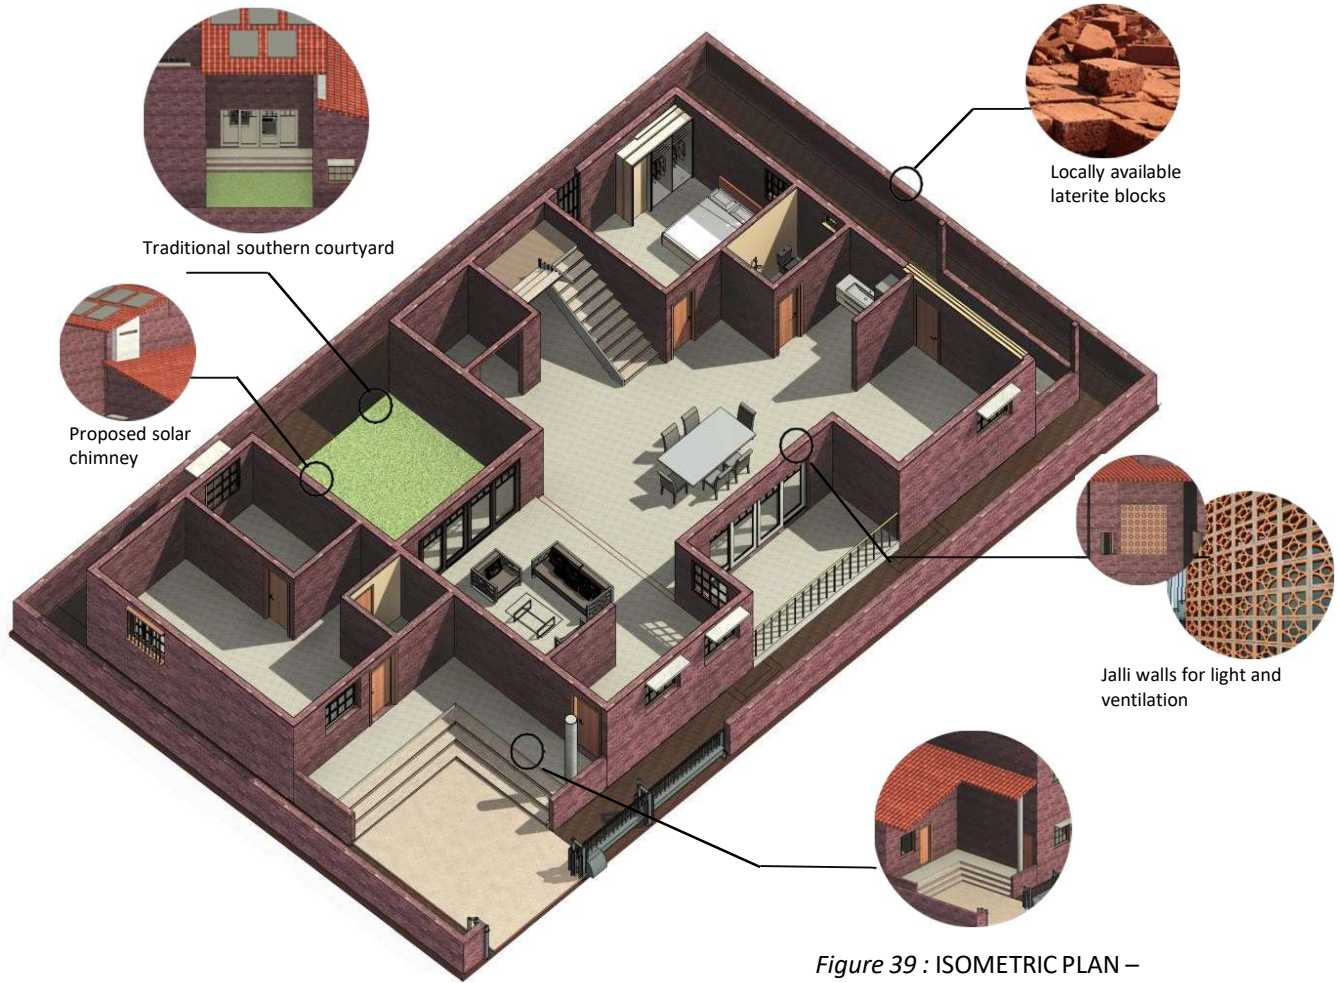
ISOMETRIC PLAN – GROUND FLOOR
